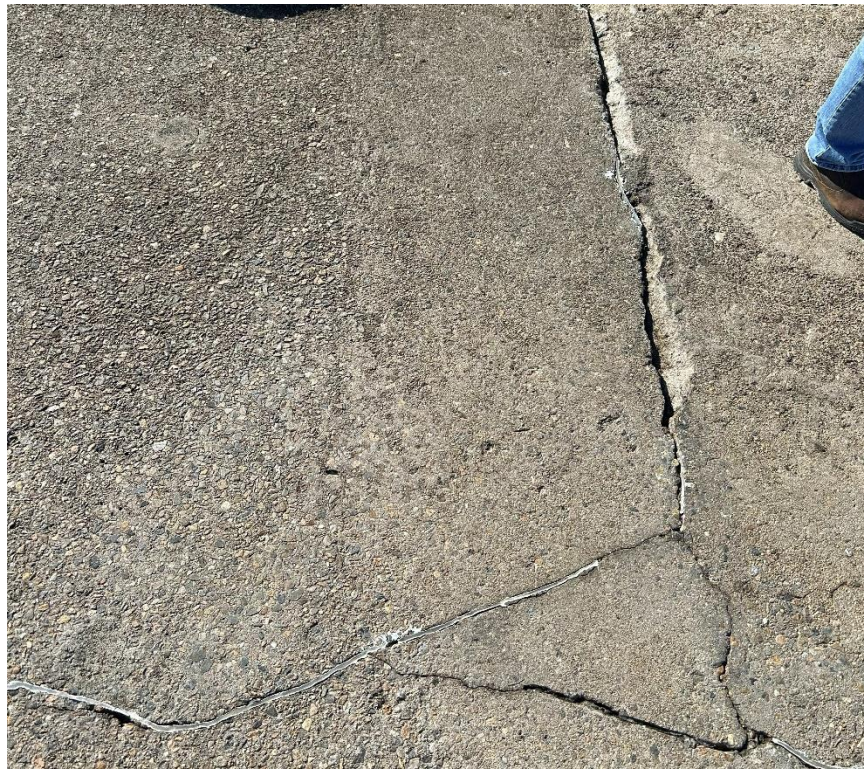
Osprey (South Beach) pier additional concrete crack formation
